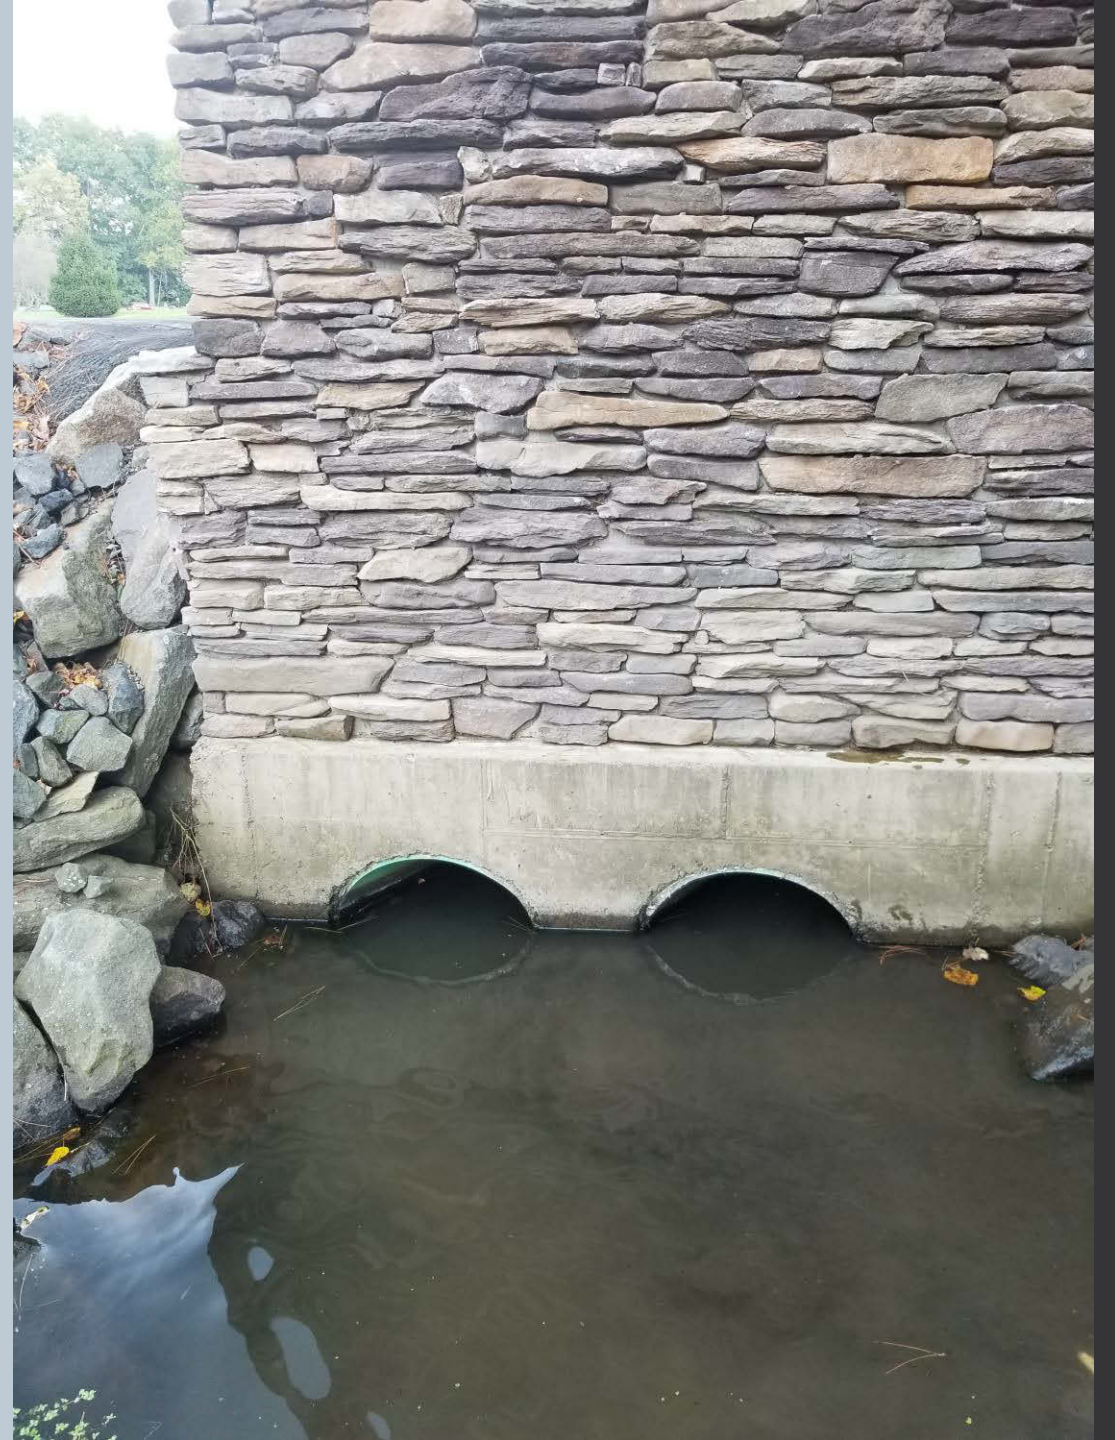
Looking upstream on the unnamed tributary to Toby Creek at the double structure pipe culvert beneath the bridge over the private road within Newberry Estates. The pool in front of the structures is sediment-laden and the half full of sediment and green algae growth.
